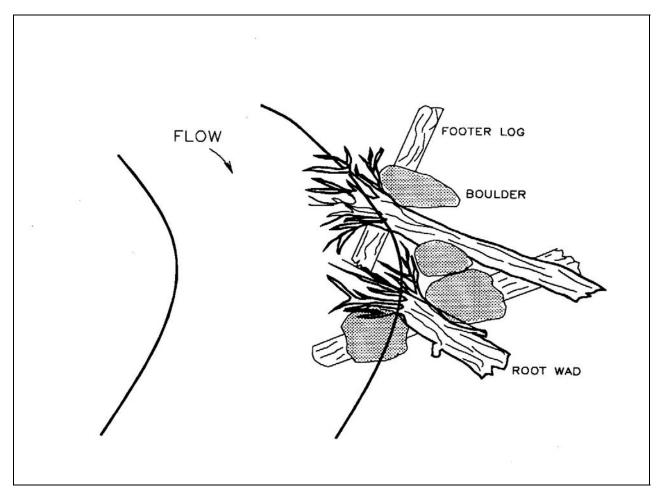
Plan view of native material revetment (Rosgen, 1993)
